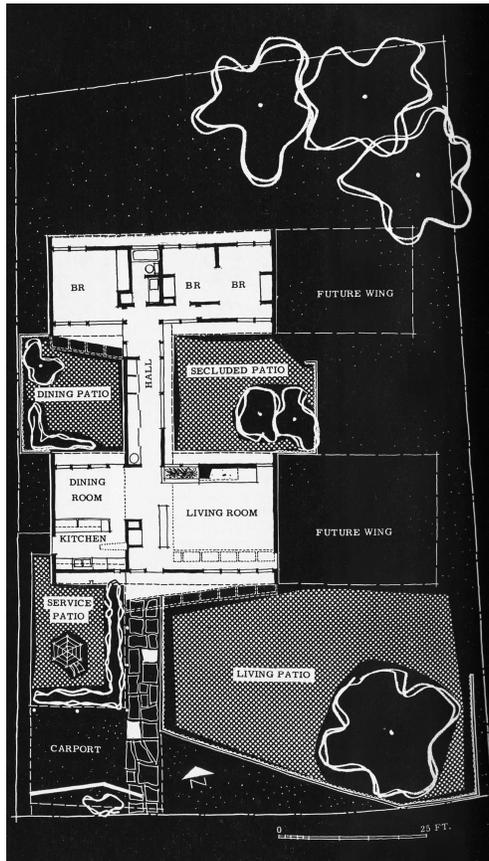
Taylor House. Plan. Curtis elaborated upon this arrangement of separate wings connected by a central gallery dividing public and private spaces for the Curtis House.
